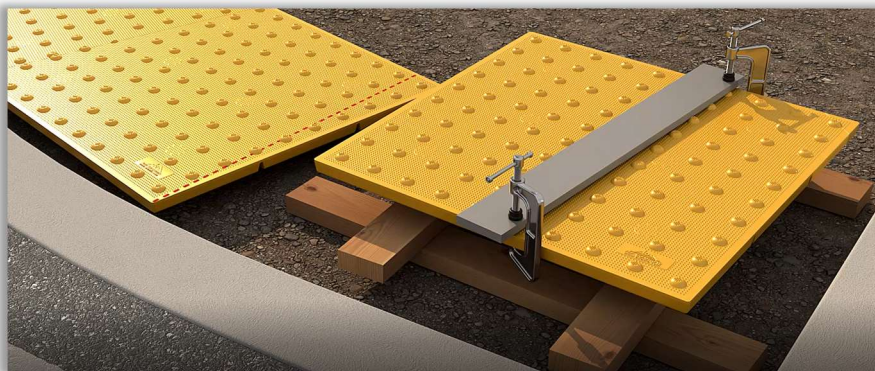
Cutting guide clamped to top surface of Cast-In-Place Replaceable panel
